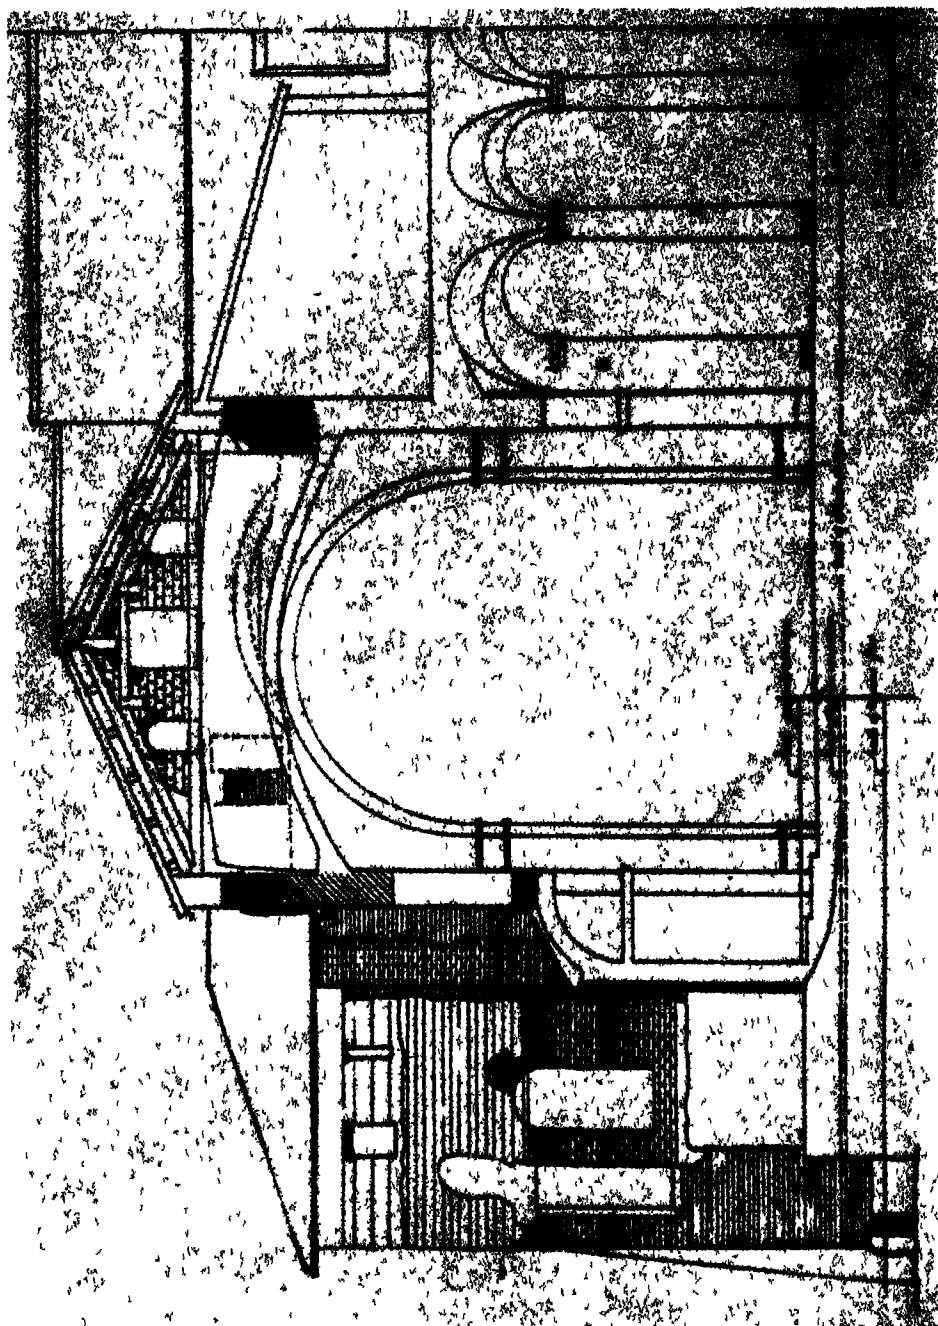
S. Pietro in Vincoli, longitudinal section (drawing W. Frankl)
